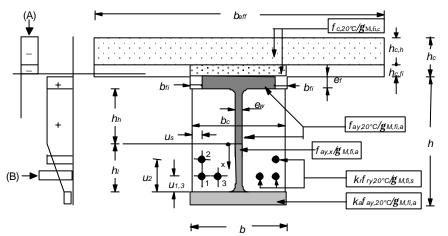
Stress distributions in concrete (A) and steel (B) for sagging moment
